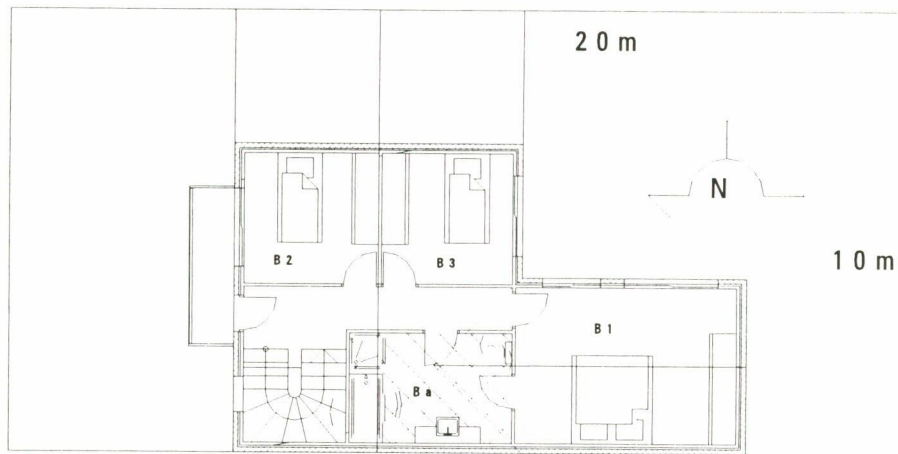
COURTYARD HOUSE WITH 12.5 M WIDE FRONTAGE
